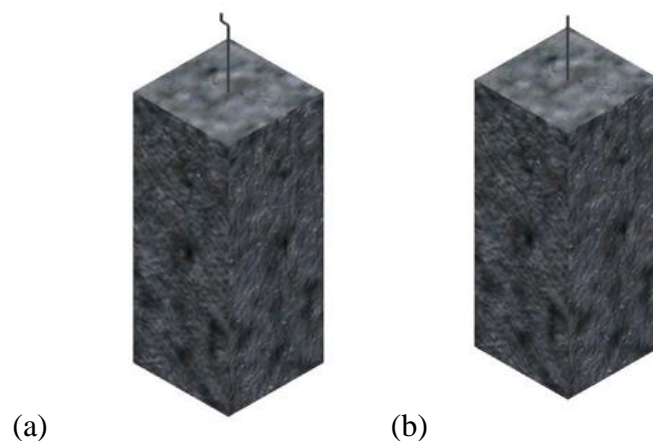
(a) Specimen with hook on protruding edge, (b) Specimen with hook removed from protruding edge
